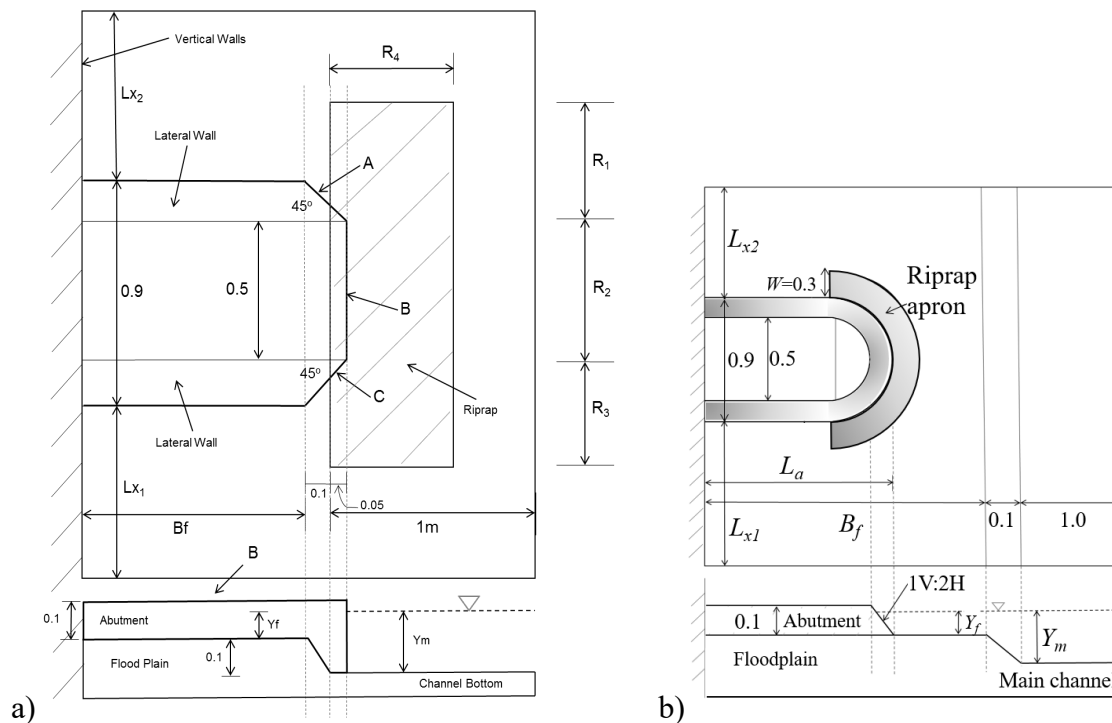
Sketch showing general layout of the preliminary numerical simulations performed for a wing-wall abutment (left) and for a spill-through abutment (right) placed on the floodplain of a straight channel. Dimensions are in meters. The wing-wall abutment geometrical set up corresponds to that used in the laboratory experiments of Melville et al. (2007). Reproduced from Wu et al. (2020a) and Wu et al., (2020b).
